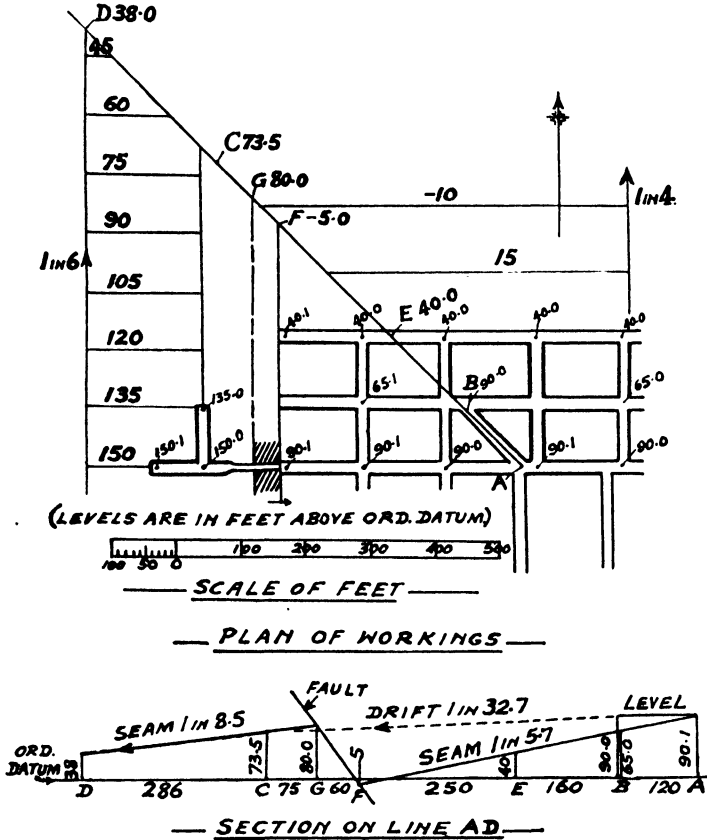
Plan of Workings and Section of Proposed Cross-Measure Drift.
